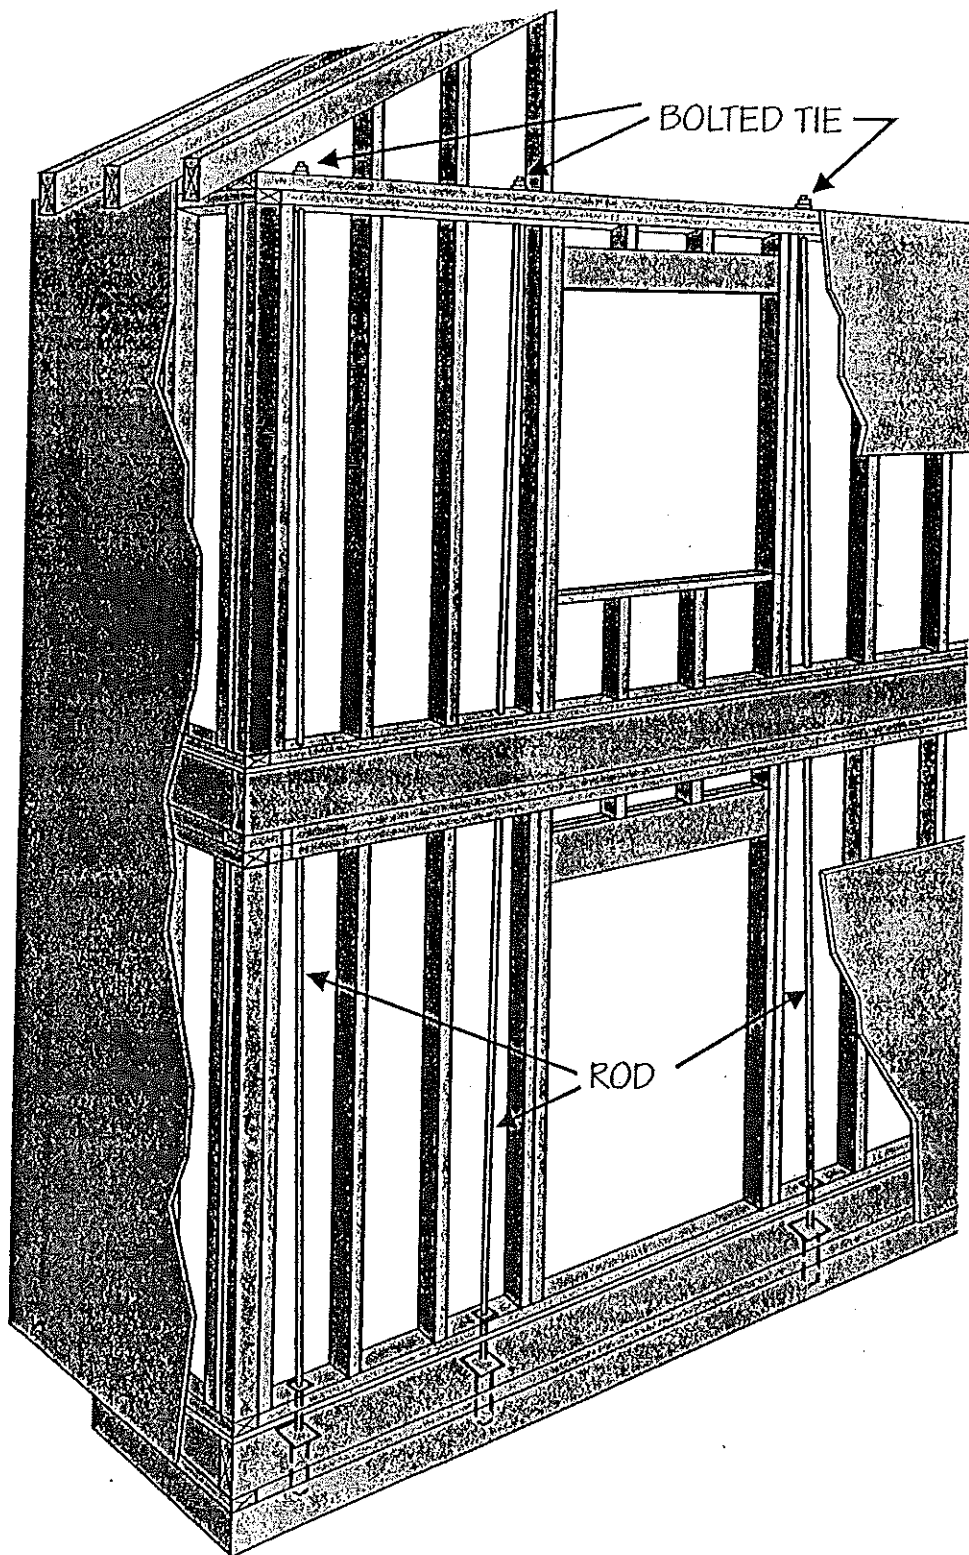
TWO-STORY ROD ANCHORAGE SYSTEM
